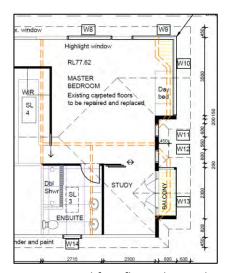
Approved first floor plan under DA-103/2021 at 45 Military Road.
